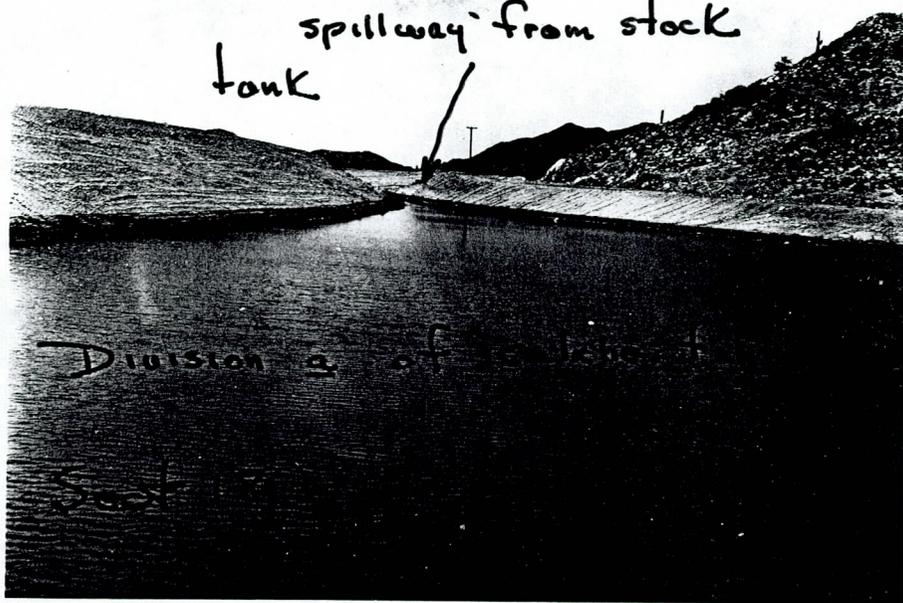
Sec. 18 - Division a of caliche tank - spill-
